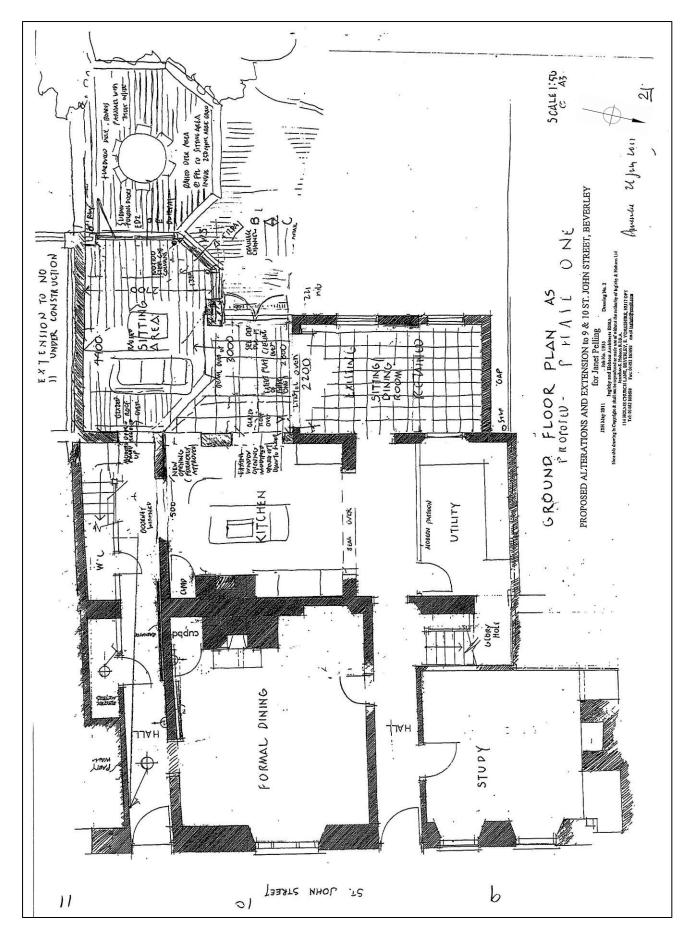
GROUND FLOOR AS PROPOSED (not to scale - drawing supplied by Ingleby & Hobson)
